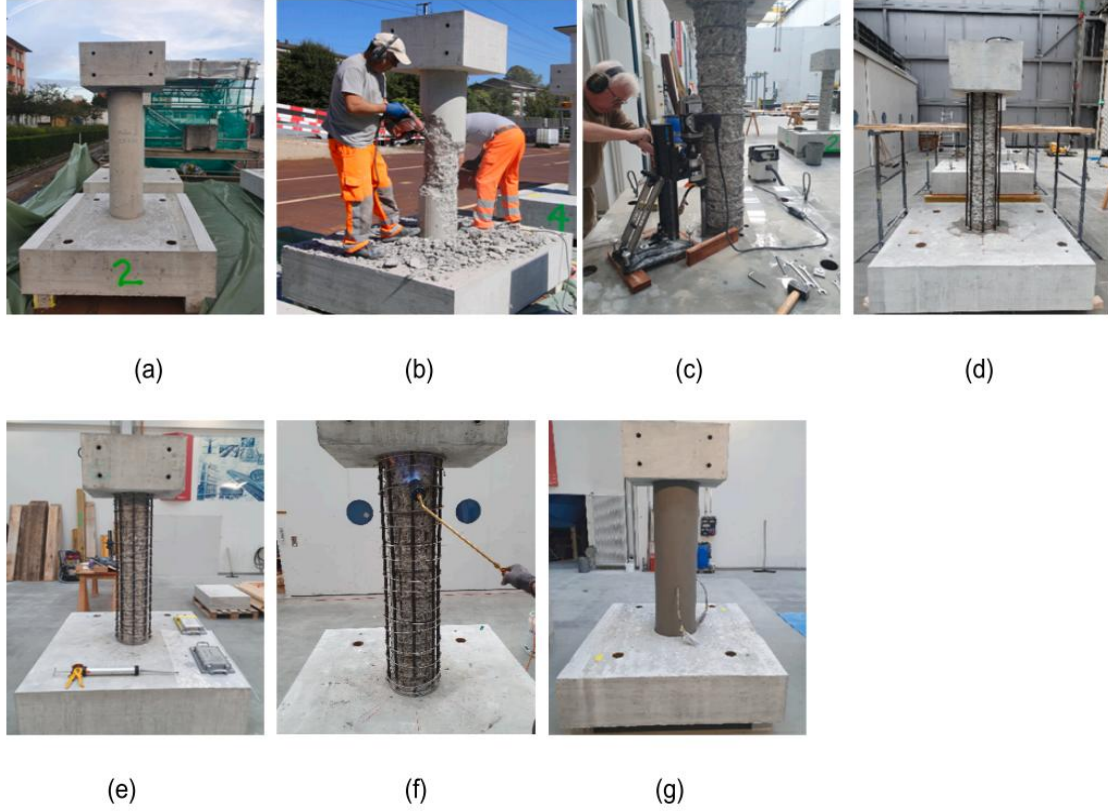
Steps of proposed self-centering technique: a) existing column; b) concrete cover removal by hammering; c) drilling of holes; d) grouted longitudinal Fe-SMA bars; e) installed helical Fe-SMA spirals; f) activation using gas torch; g) after shotcreting.
